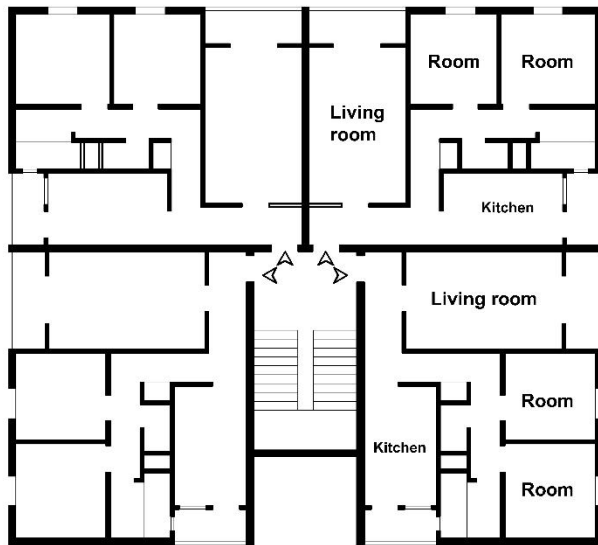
Planned building with four apartments per floor in Cité 5 Juillet, Djelfa. (Source: Authors, 2024)
